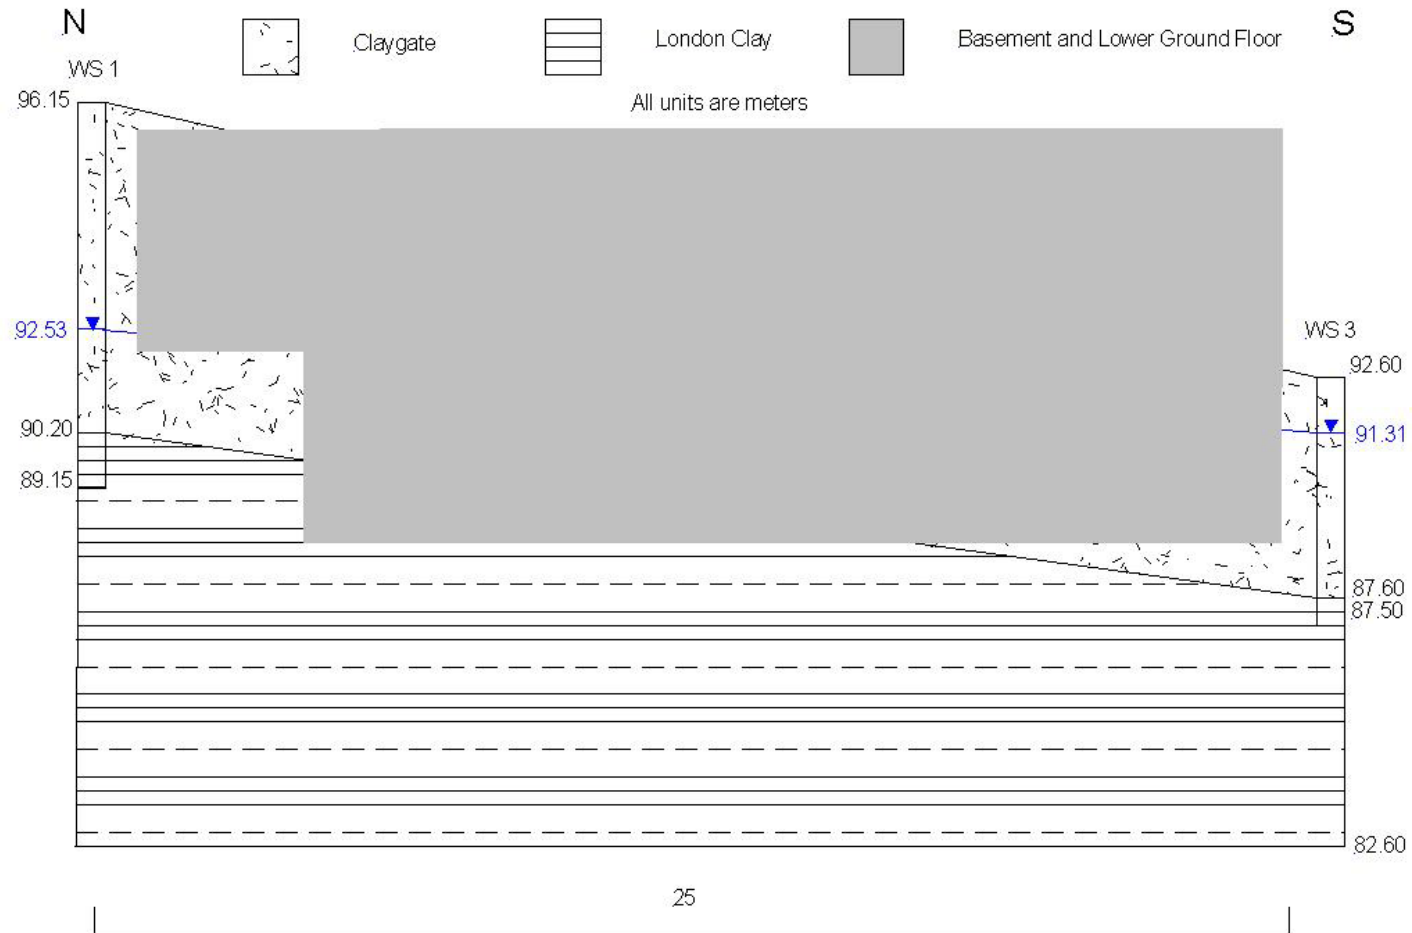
Cross section A – Generalised cross section from north to south across the Site
